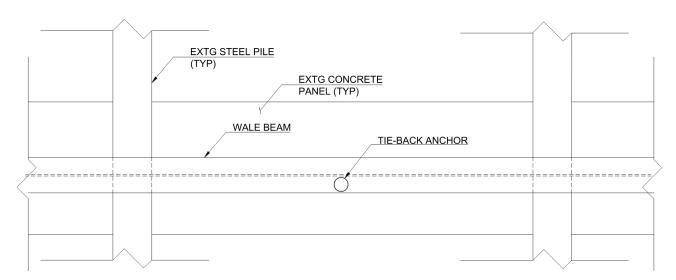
Repair Option B, Wale Beam and Tieback Anchors, Elevation View
